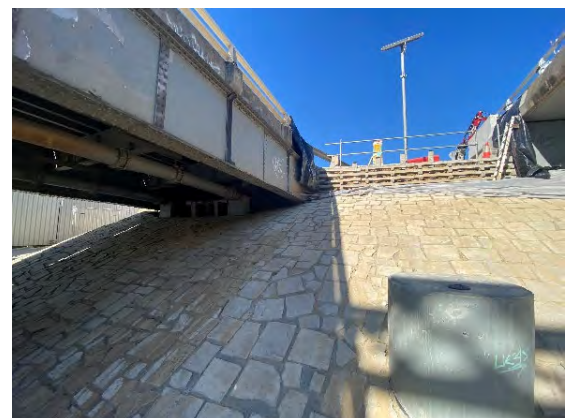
Southern Bridge Abutment (Source: FBE)
